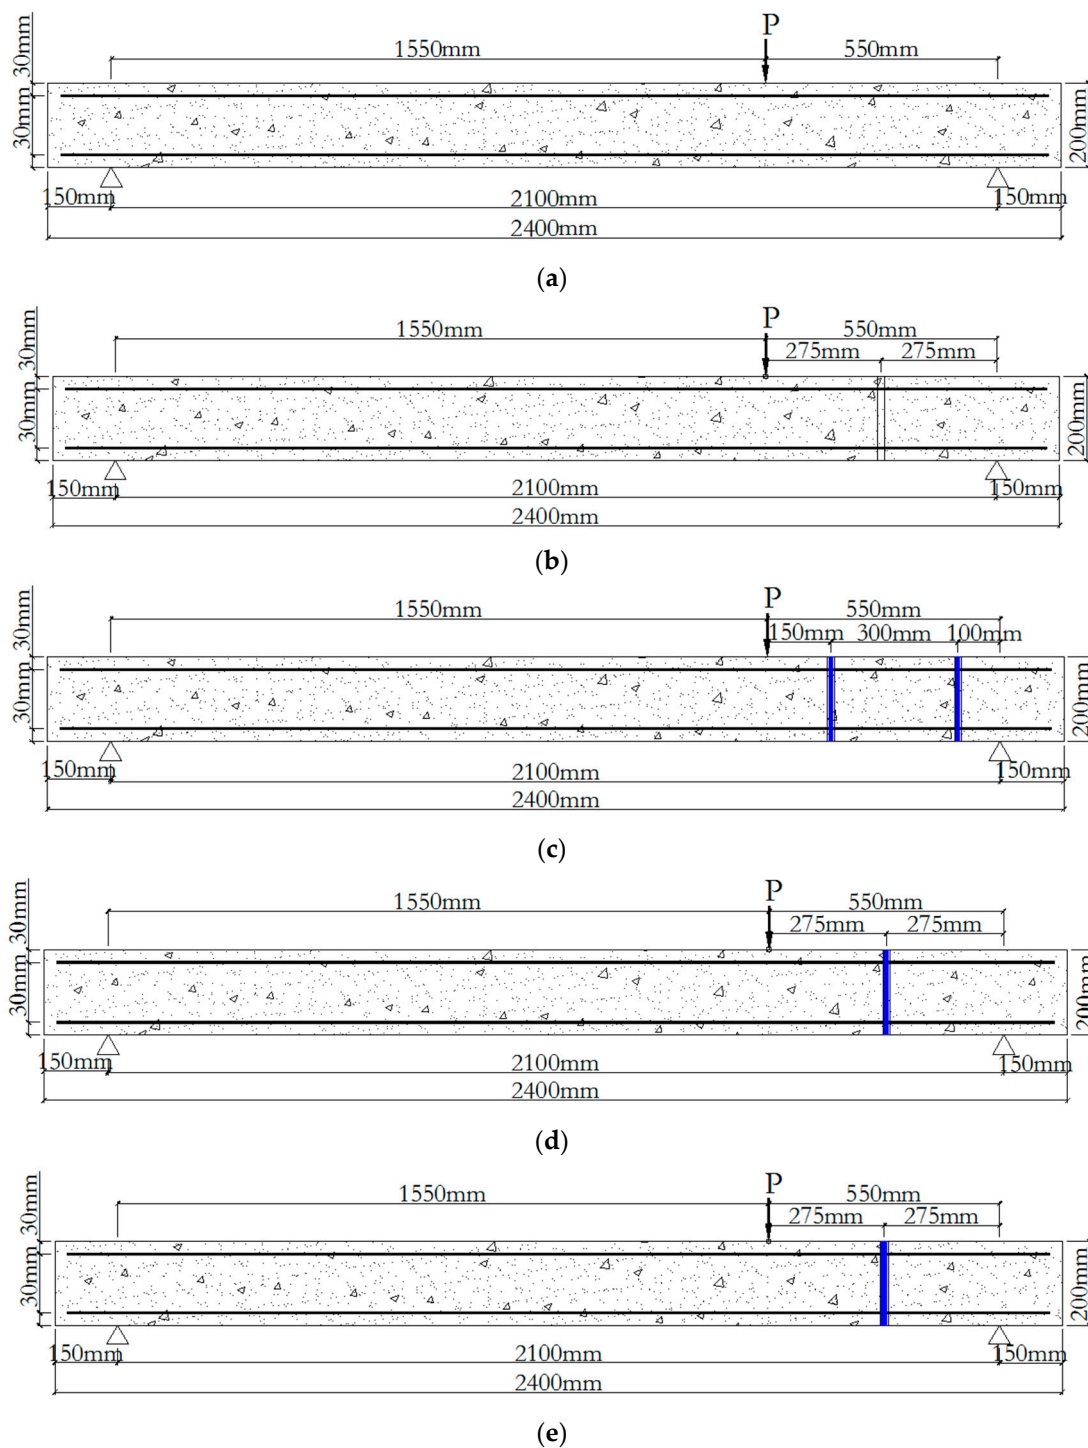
Details of test specimens in elevation: (a) Specimen coded as S-Con; (b) Specimen coded as S-D-1; (c) Specimen coded as S-S-2-10, S-B-2-9, S-G-2-9, S-C-2-9; (d) Specimen coded as S-C-1-9; and (e) Specimen coded as S-C-1-13.
